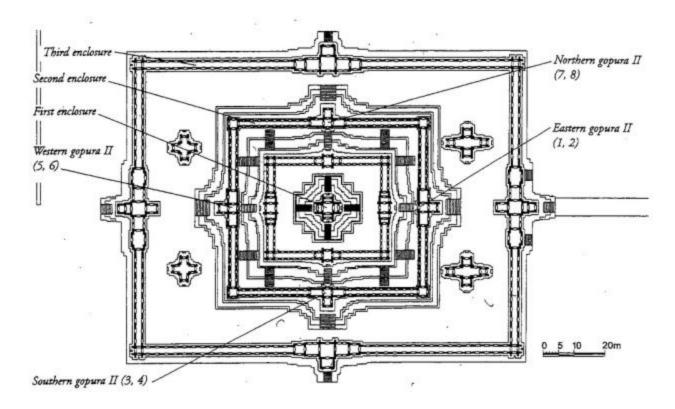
A plan of Bapuon temple, which was built around 1060 by Angkorean King Udayadityavarman II.
